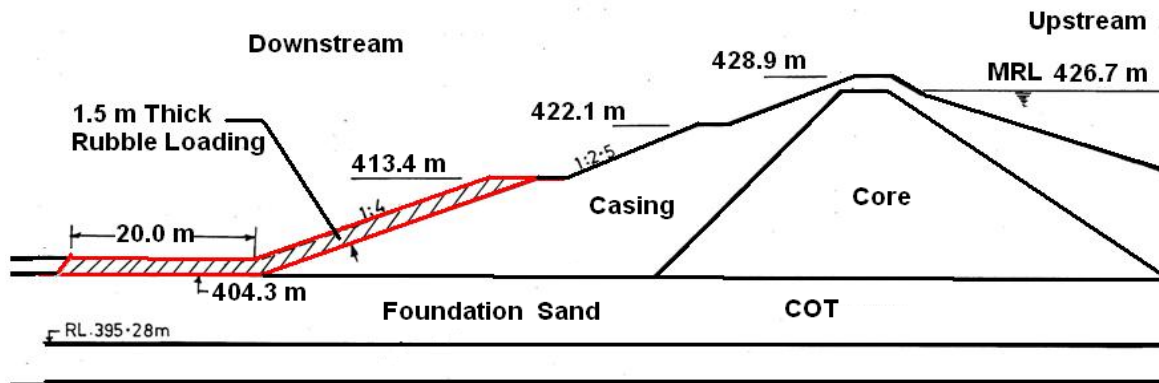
1.5 m thick rubble filled loading on downstream slope
